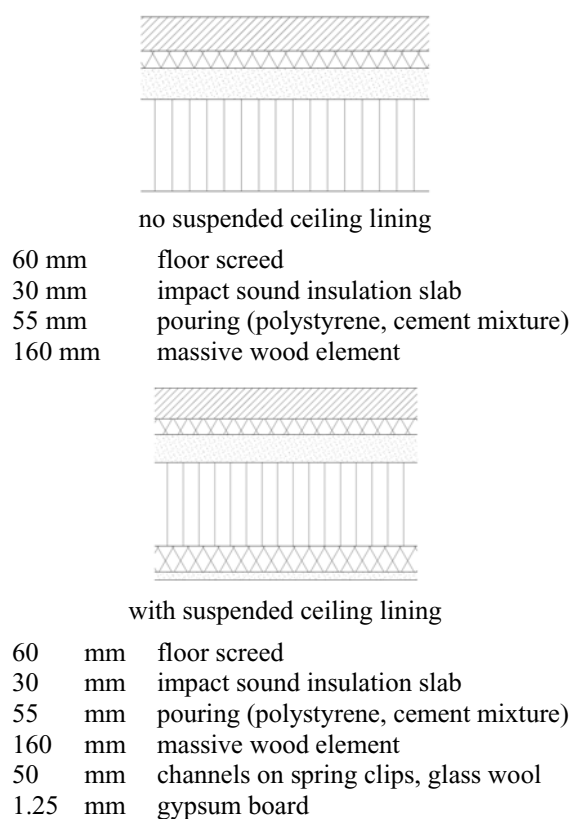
Examples of wooden ceilings with floating floor with and without a suspended ceiling lining
